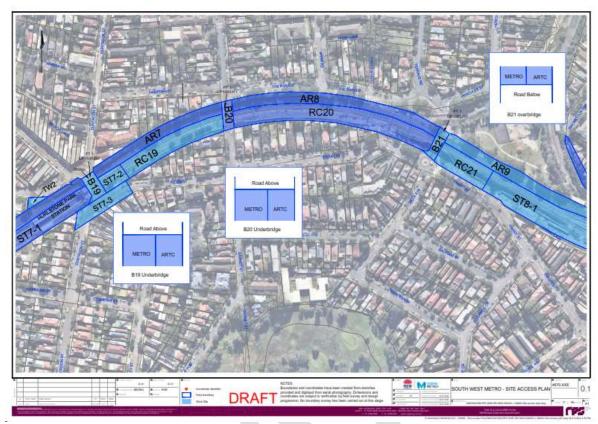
Location of Duntroon Street overbridge (Far left B19) (Source: Sydney Metro)
